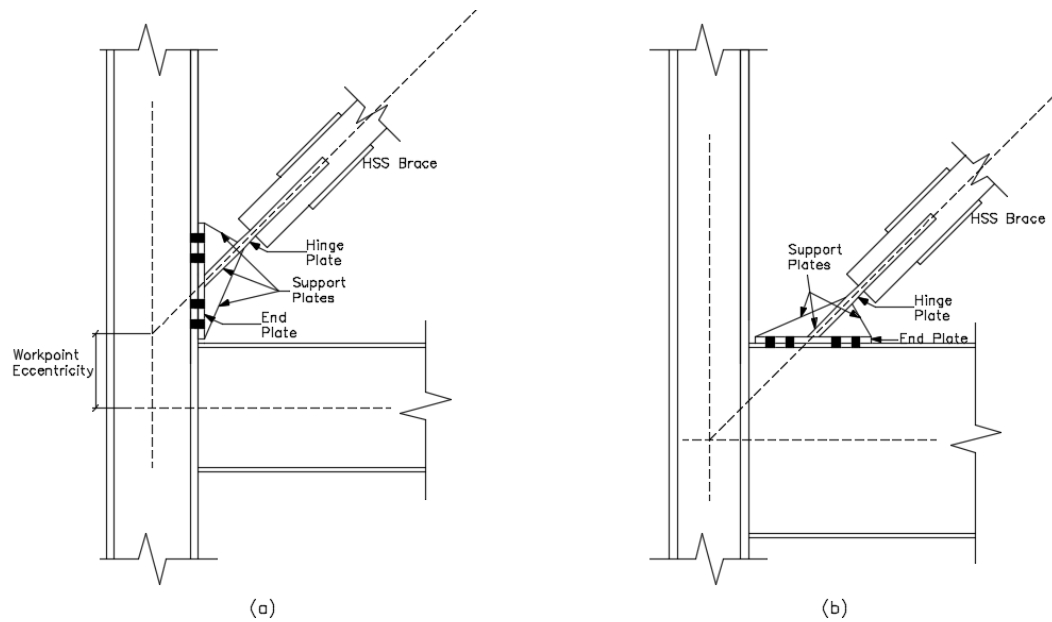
Hinge & plate connections: (a) Bolted to the column flange; (b) Bolted to the beam flange
